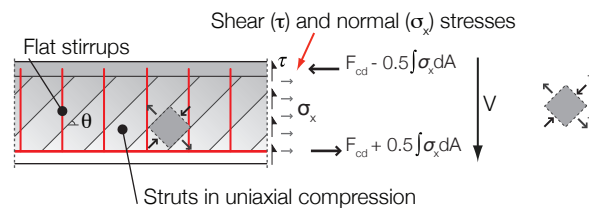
Additional tension force in the truss model (after Orr et al, 2011).
